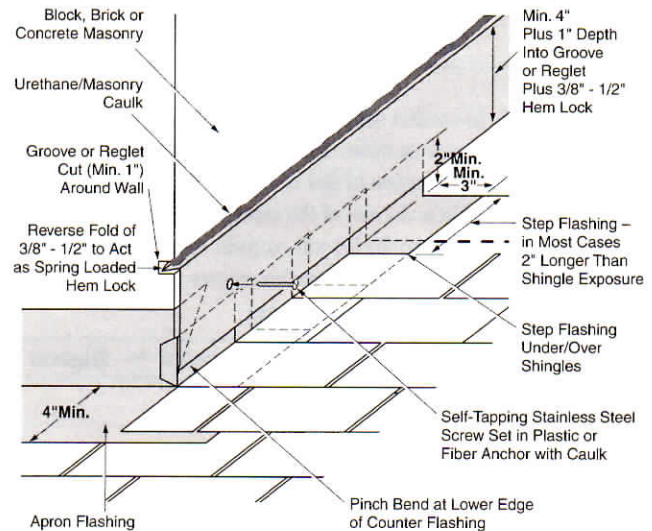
Continuous counter flashing against masonry chimneys and walls.
